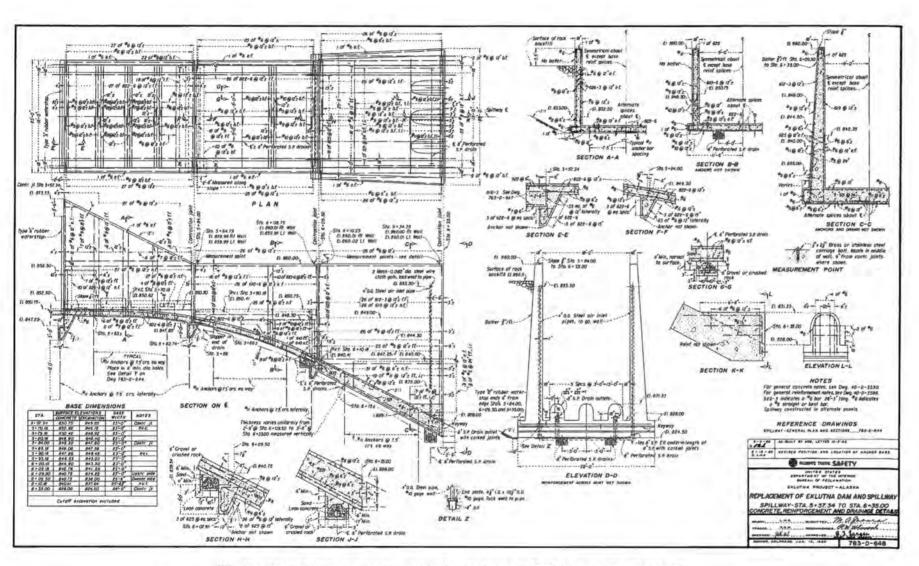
Spillway design details -- Station 5+57. 34 to station 6+35. 00.
